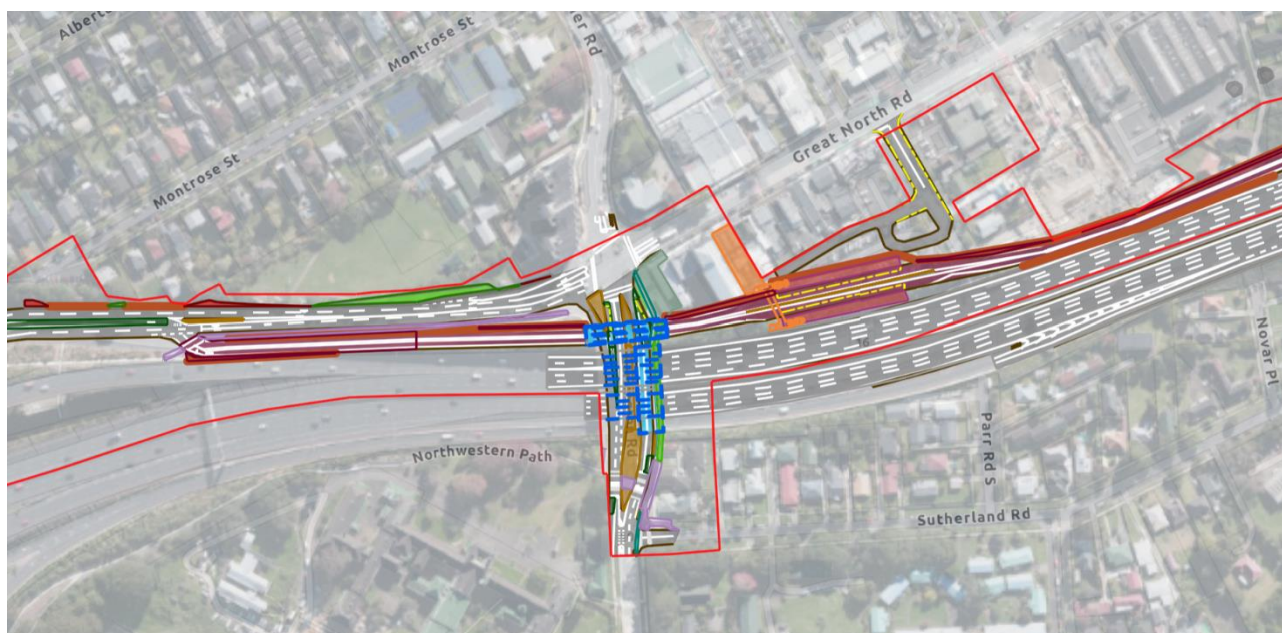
Plan of the Point Chevalier station location, busway carriageway, underpass and proposed new bridge over SH16
